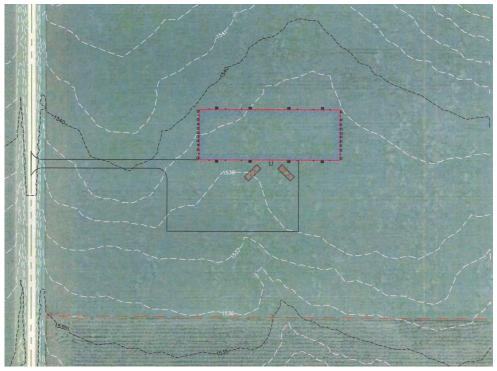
Proposed site plan (SW ¼, Section 15, T-103-N, R-44-W, Rock County, Minnesota).
